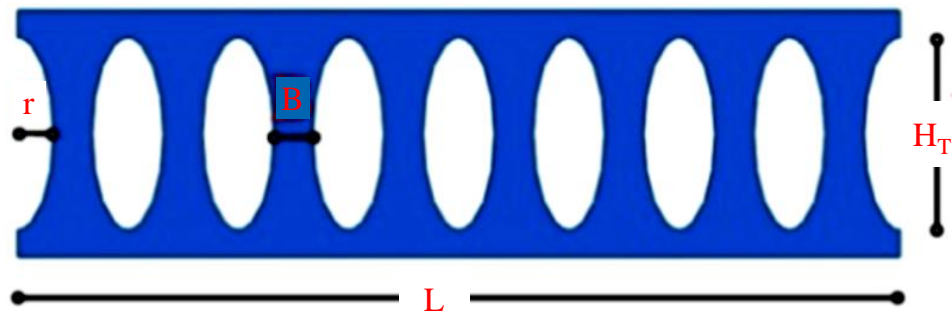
Slit dampers with elliptic holes used by Shahri and Mousavi (2018) in beam-column connection
